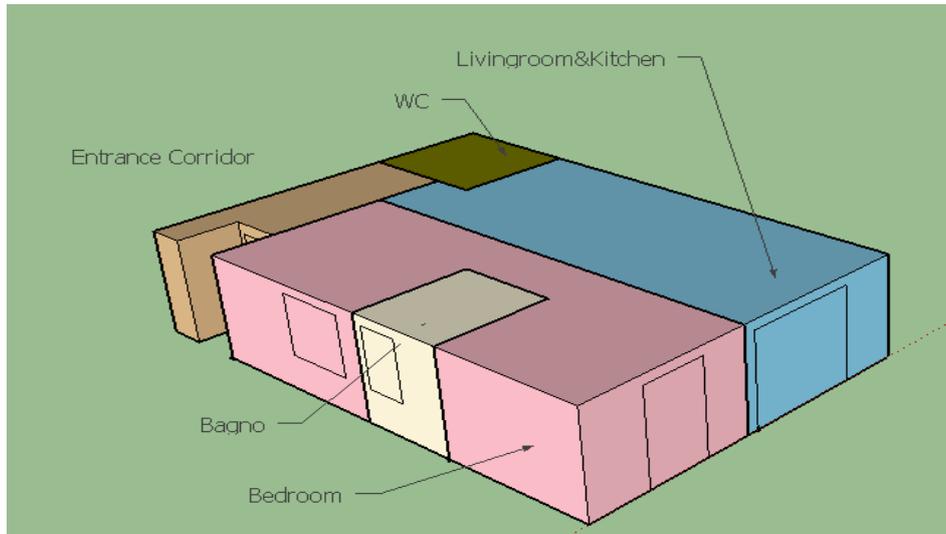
Leaf House 3D Model Ground Floor West Apartment
